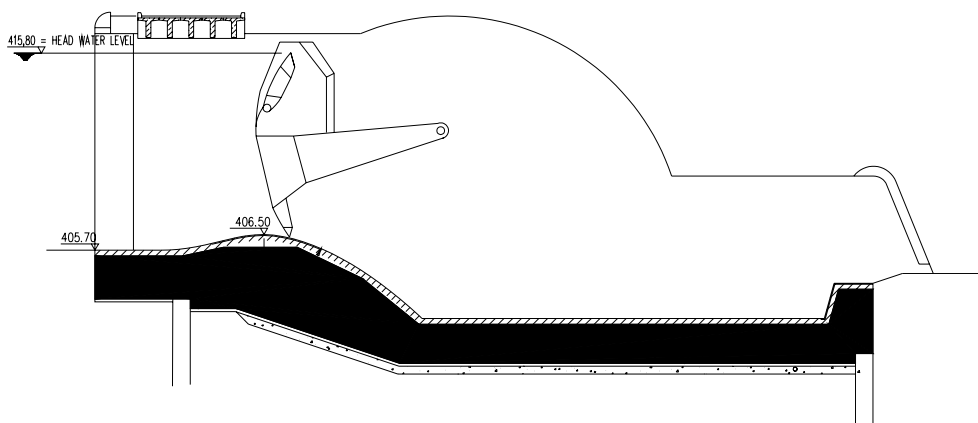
Rott-Freilassing power station – new plant, section through weir – spillway
